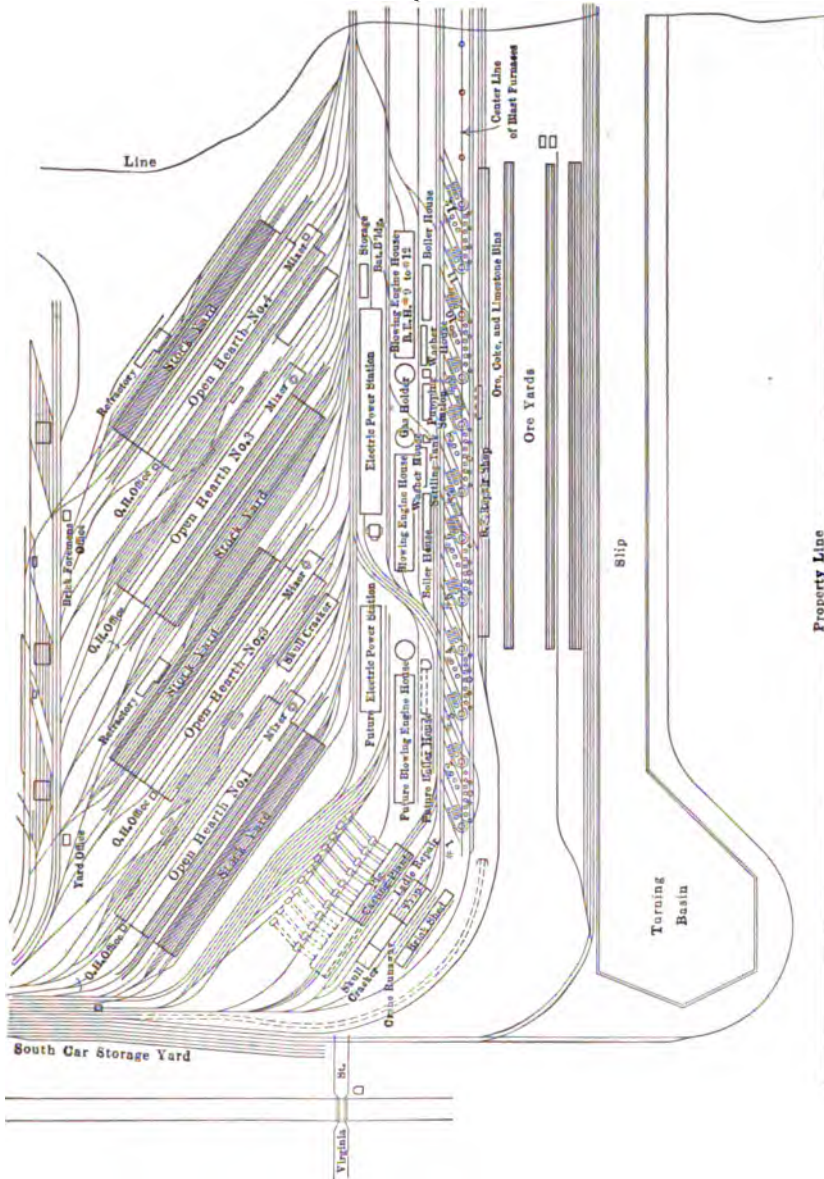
General ground plan and track layout for the plant of the Indiana Steel Company at Gary, Ind.
